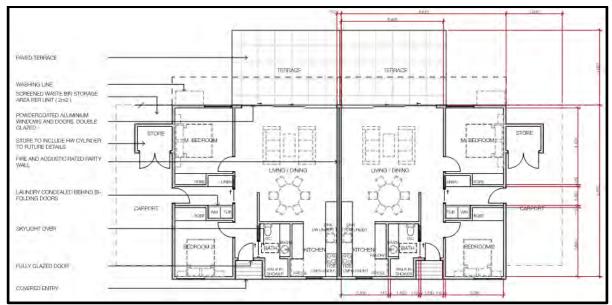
typical floor plan of the proposed units (MJ Architecture, 2019)
